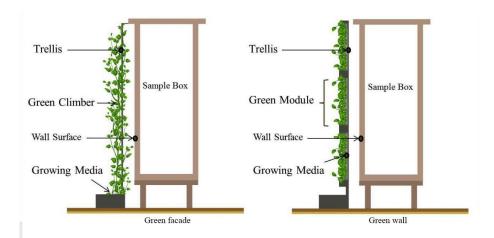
Sample detail of green façade and green wall (Safikhani et al,.2014).
